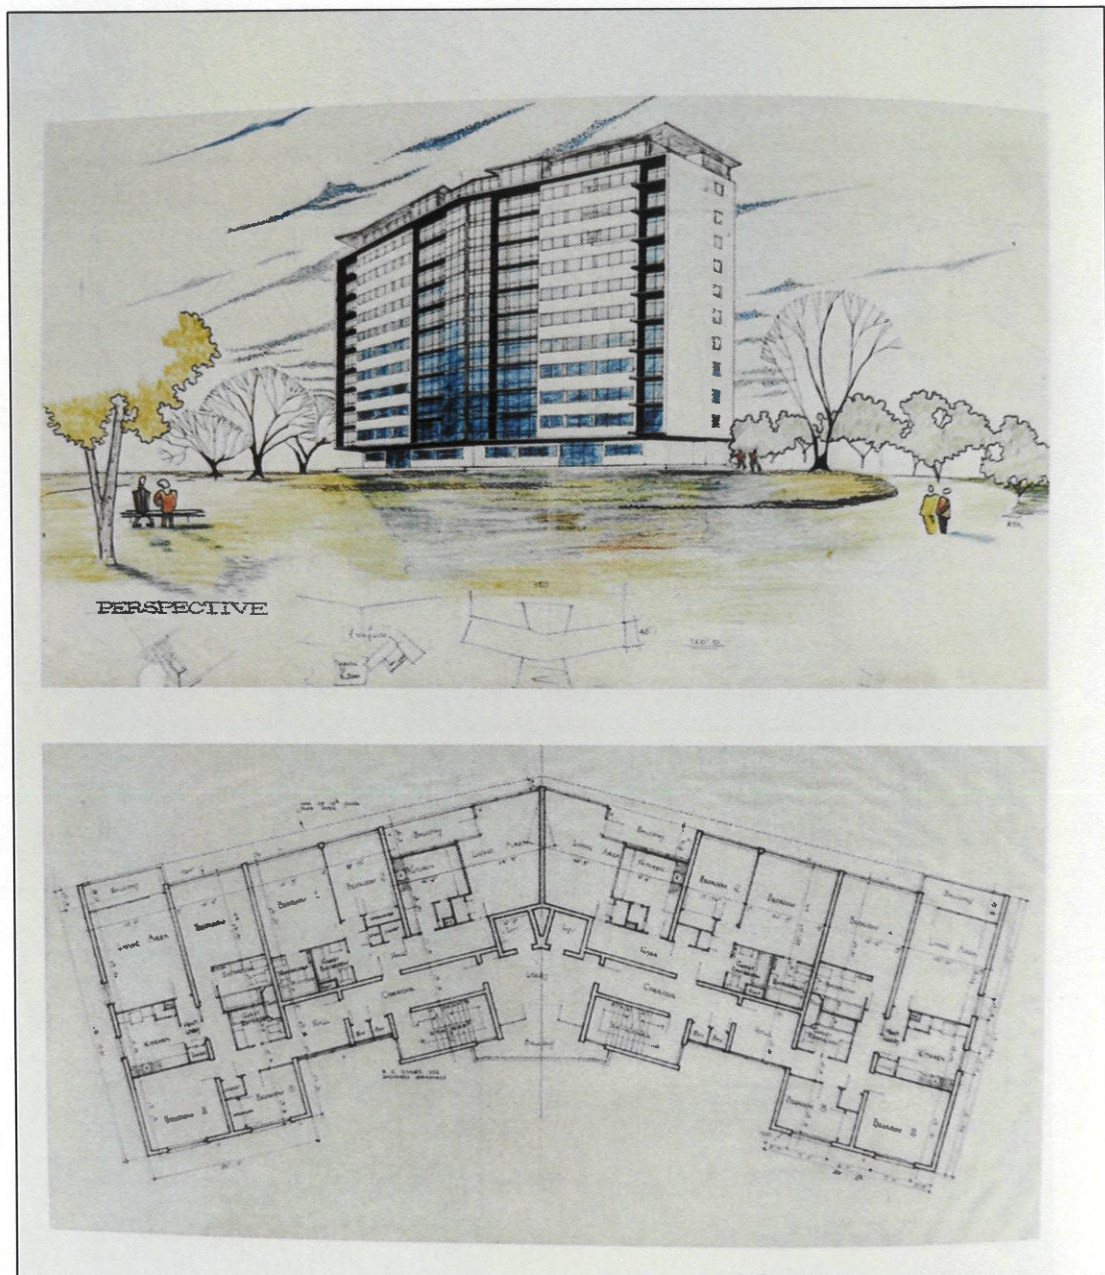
Concept drawing of Ardoyne House and internal layout drawing. (Source: O’Riordan, C. (2016). *House and Home, Residential Projects from the Collections of the Irish Architectural Archive*, Irish Architectural Archive.)
